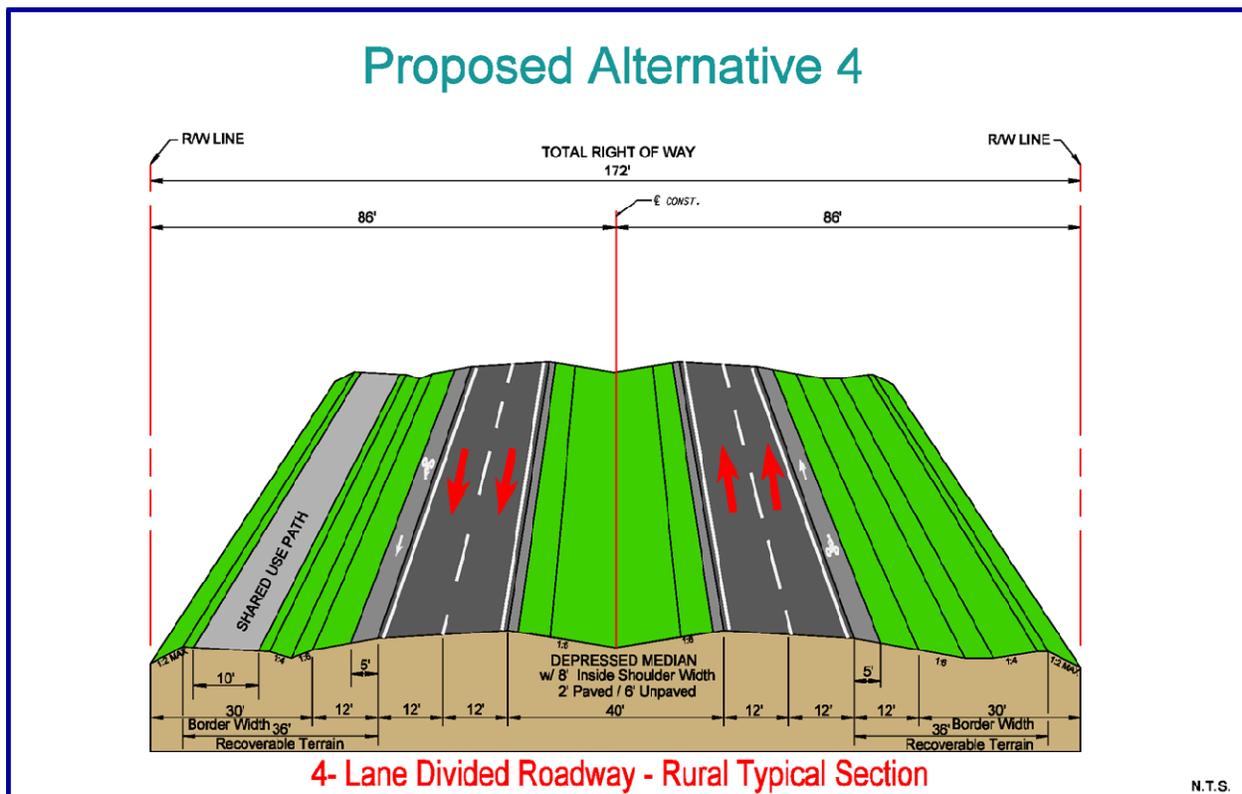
Alternative 4 Proposed Typical Roadway Section (Rural)
